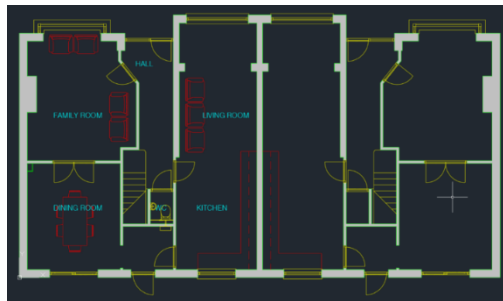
AutoCAD Ground Floor Plan created from accurate surveying.
